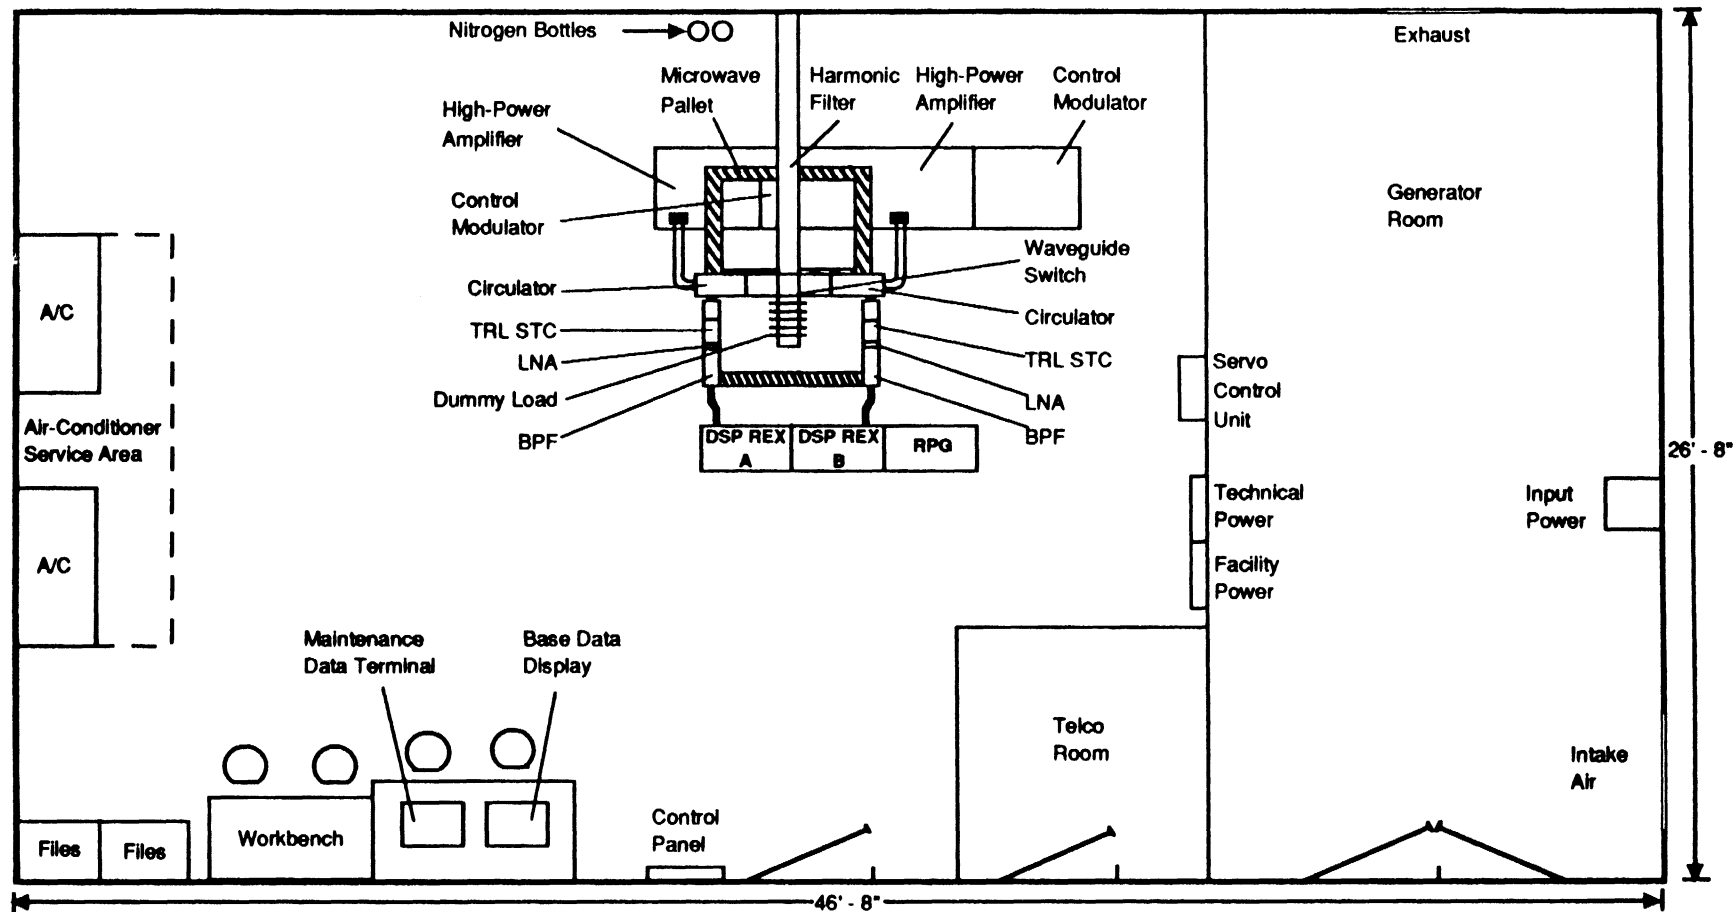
TDWR EQUIPMENT LAYOUT
